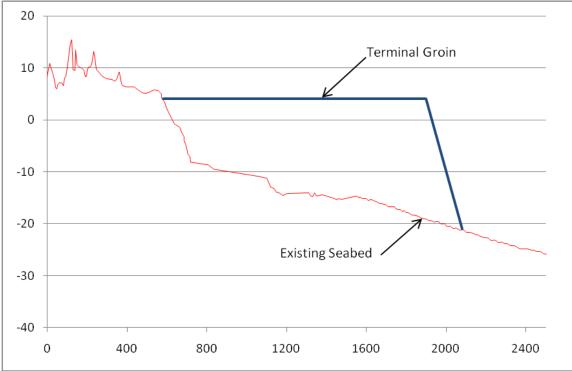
Long Groin Cross Section on a Steep-Sloped Beach
